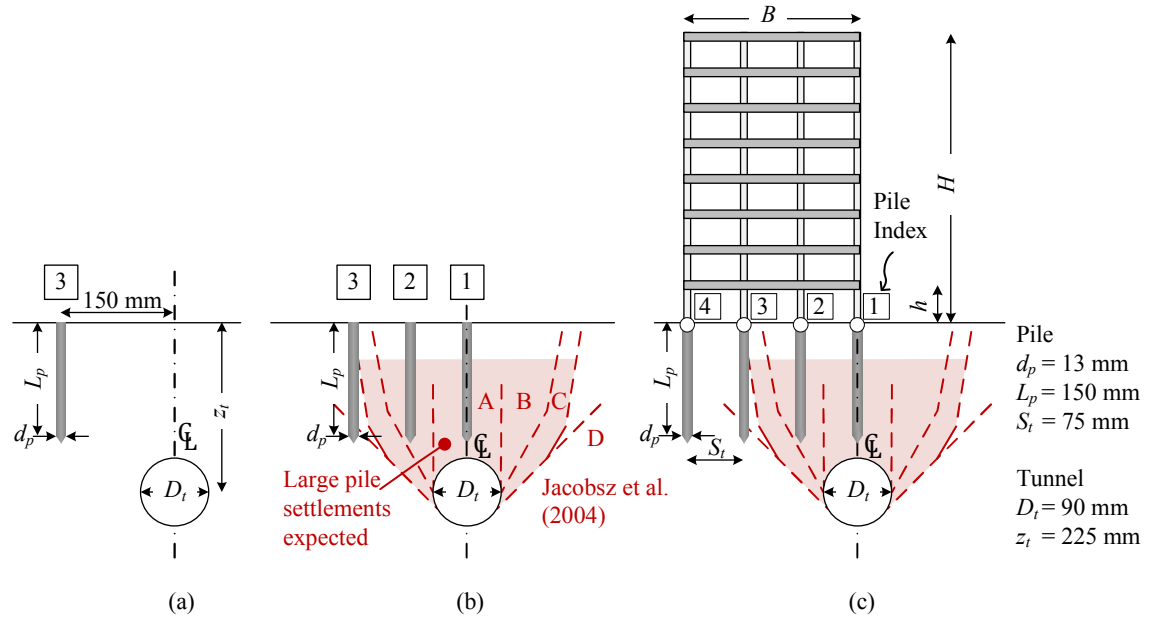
Test layout (in model scale): (a) loading tests, (b) tunnelling beneath a single pile (showing locations of piles; only single pile installed for each test), and (c) tunnelling beneath a piled frame (using the CCNM technique).
